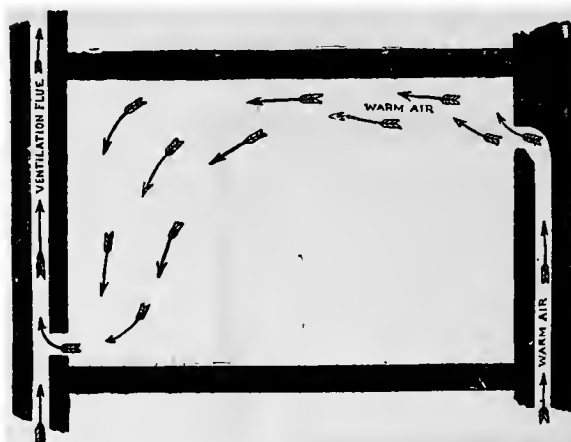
Gravity system, with inlet high and outlet near the floor on the opposite side
